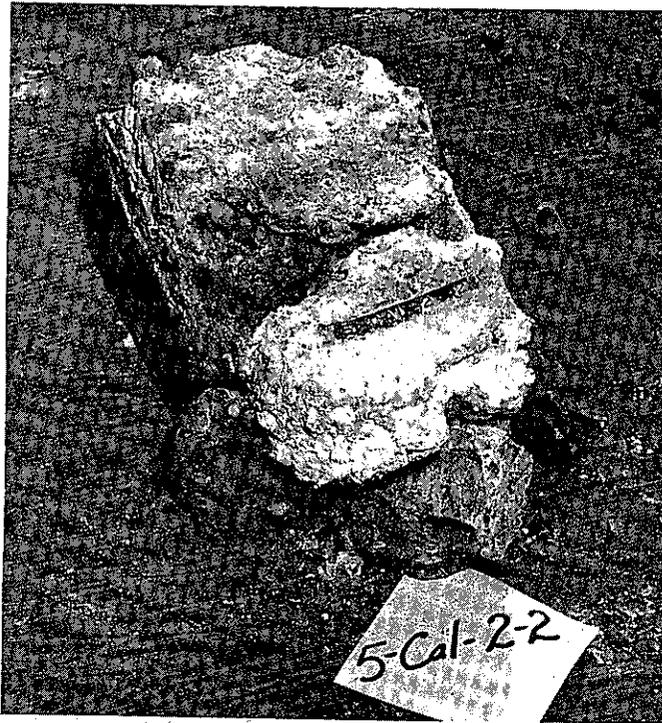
5-sack, Type II cement concrete specimen after 42 months of sulfate exposure. Both 5-sack, nonair-entrained, Type II cement beams removed from study.
